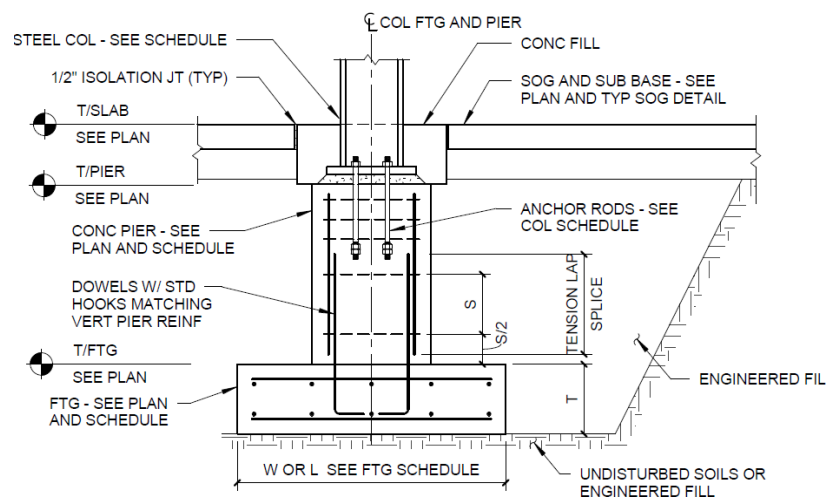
Typical Column Footing with Pier (S-3.01, Detail 1)
